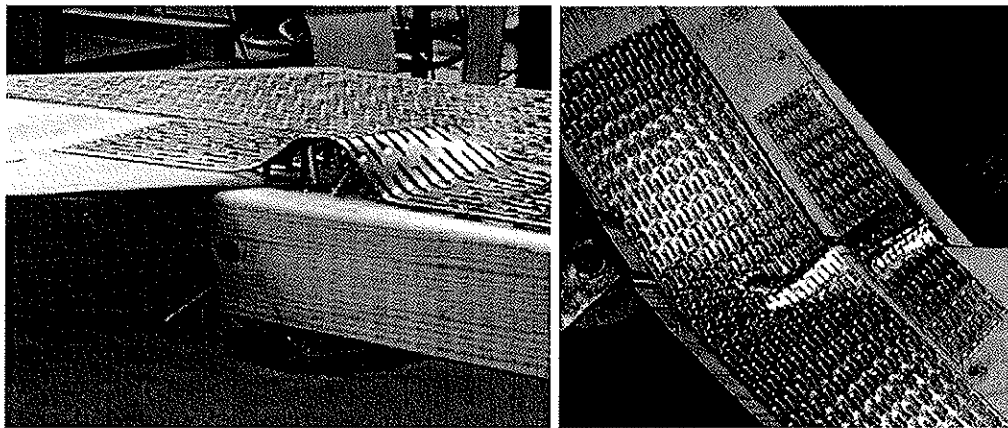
Failure mode for test specimens 3.1 and 3.4.
